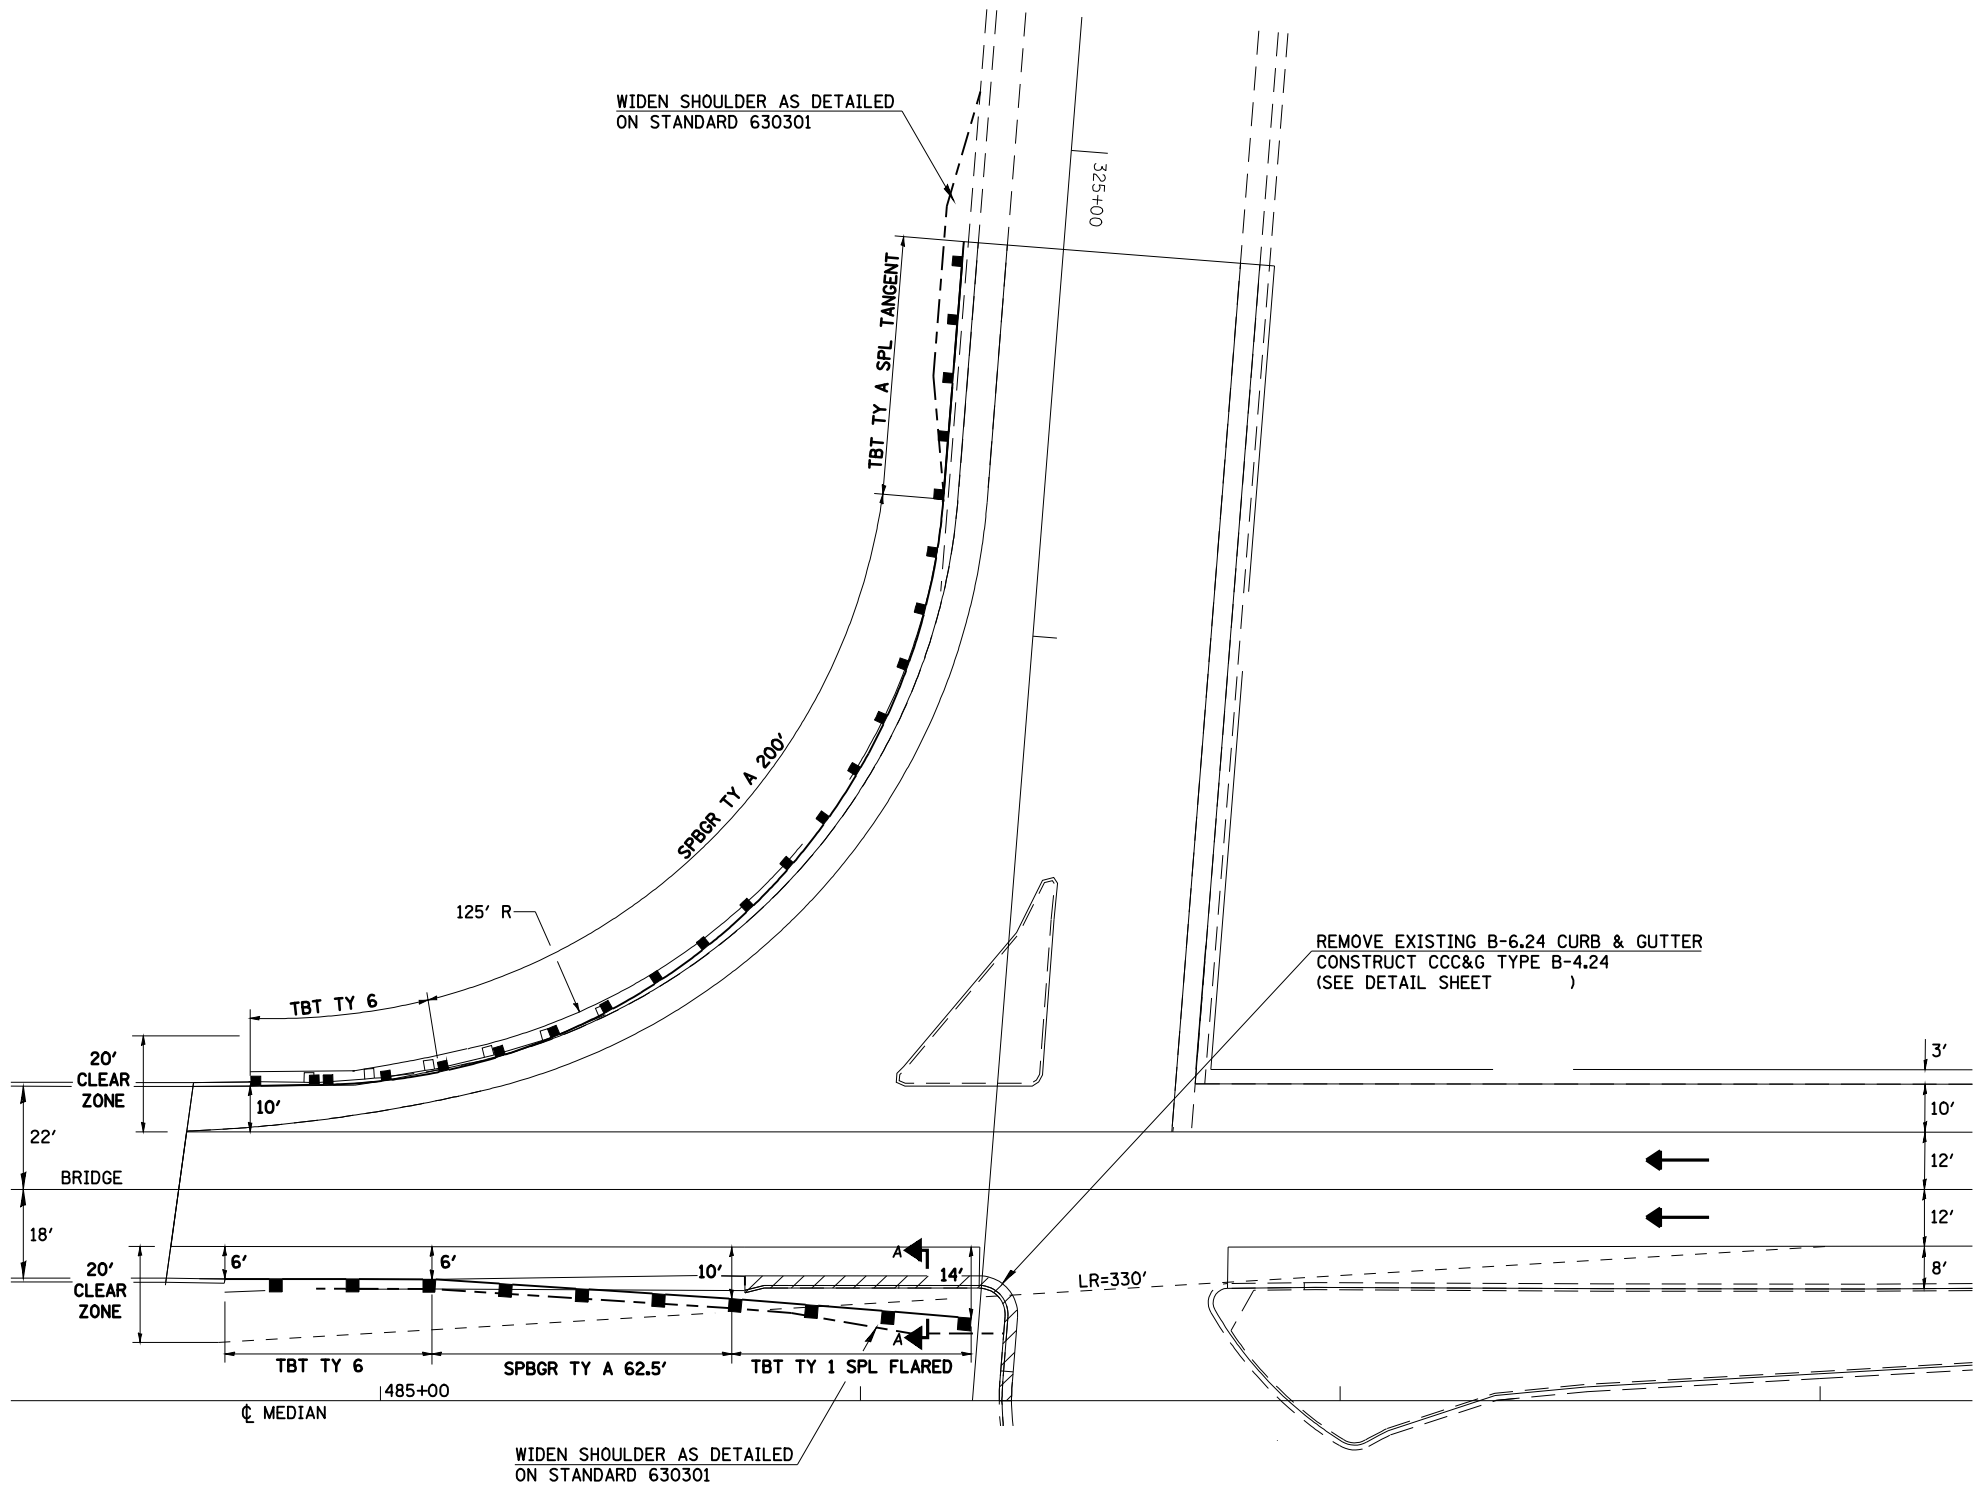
DETAIL OF GUARDRAIL AT DUAL STRUCTURES
